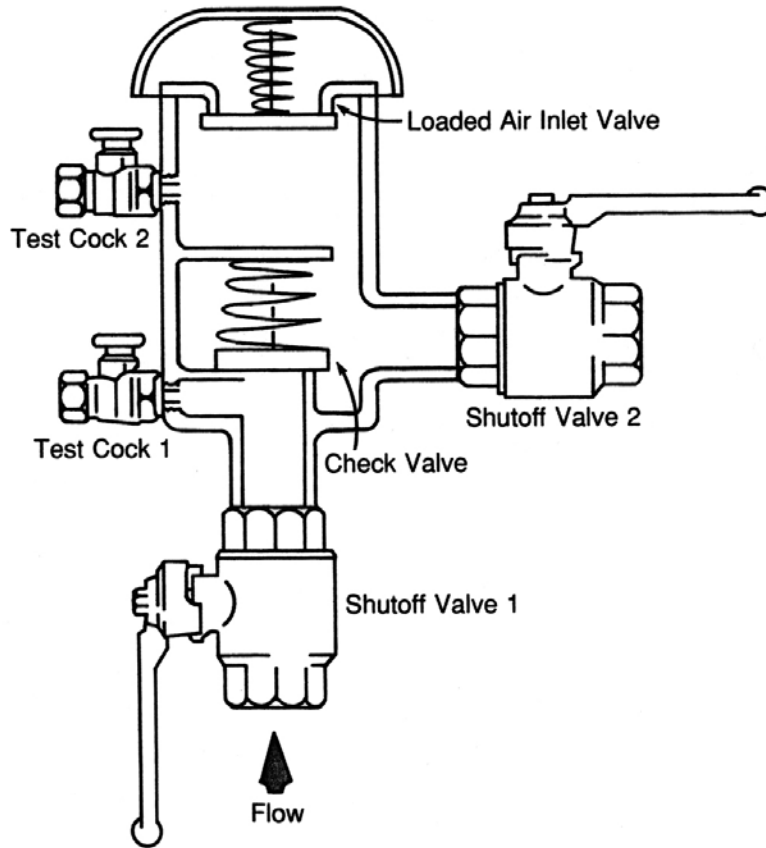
Schematic of Pressure Vacuum Breaker Assembly ¹³
